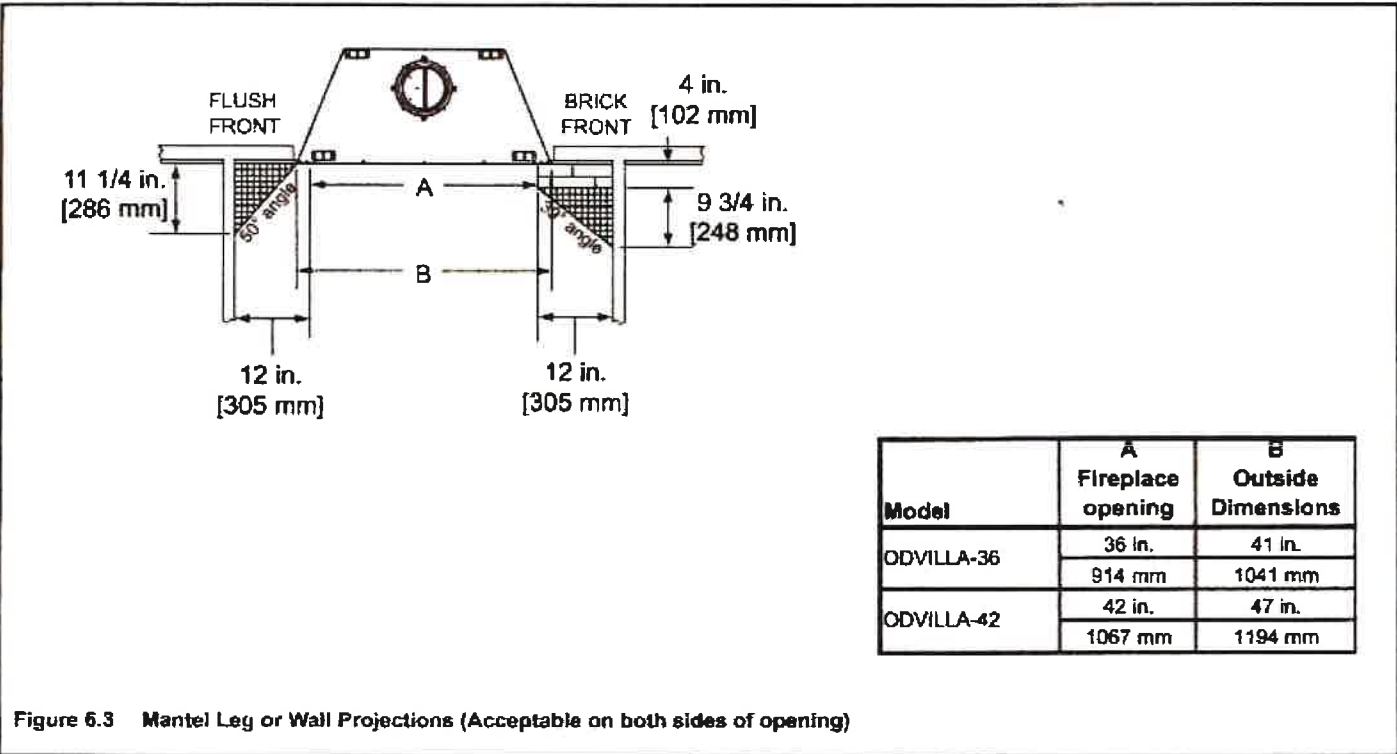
Mantel Leg or Wall Projections (Acceptable on both sides of opening)
